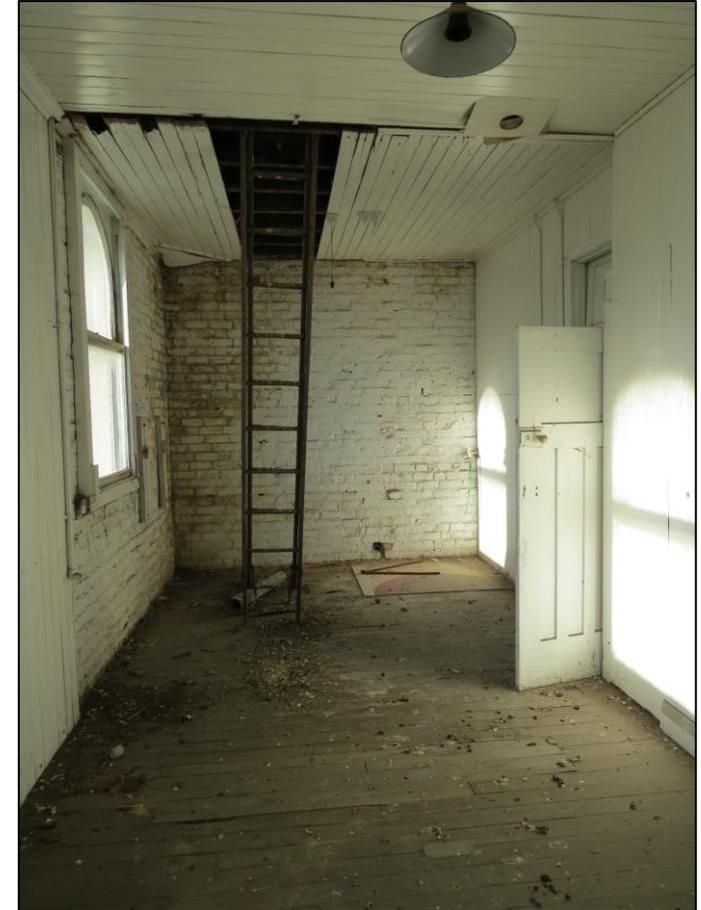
Room 46, facing east. W52 (left) and D39 (right). Note brick exterior walls.
